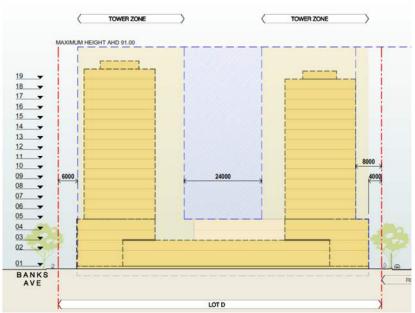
Building sections for Lot D from approved Concept Plan (DA-2019/386)
